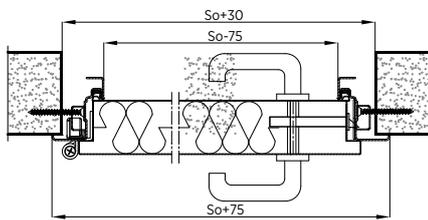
Installation of the ECO Tech single-leaf seamless door with a corner frame without a thermal break to a steel structure - horizontal cross-section
